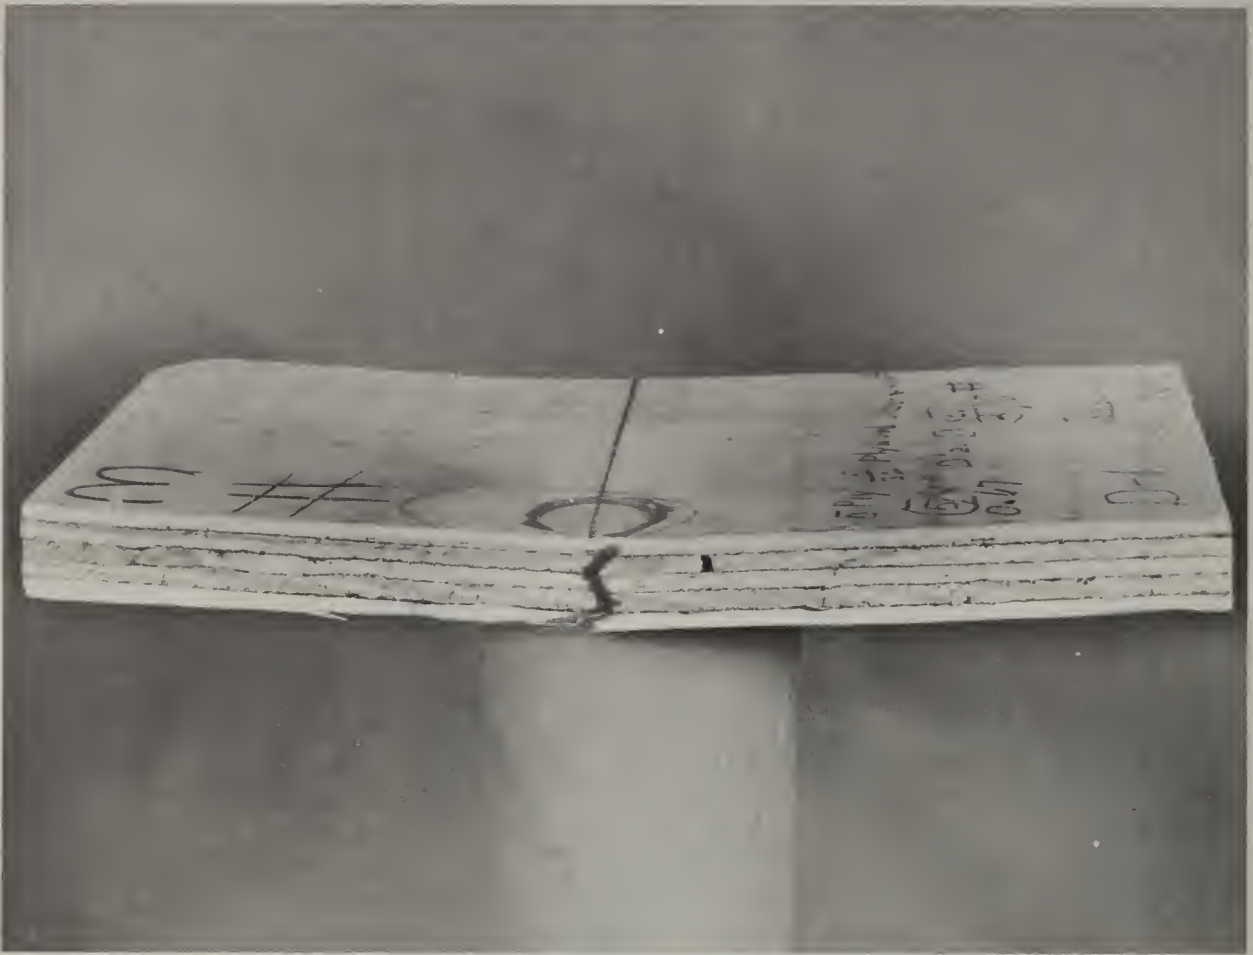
TYPICAL FAILURE OF FLOOR SYSTEM A
